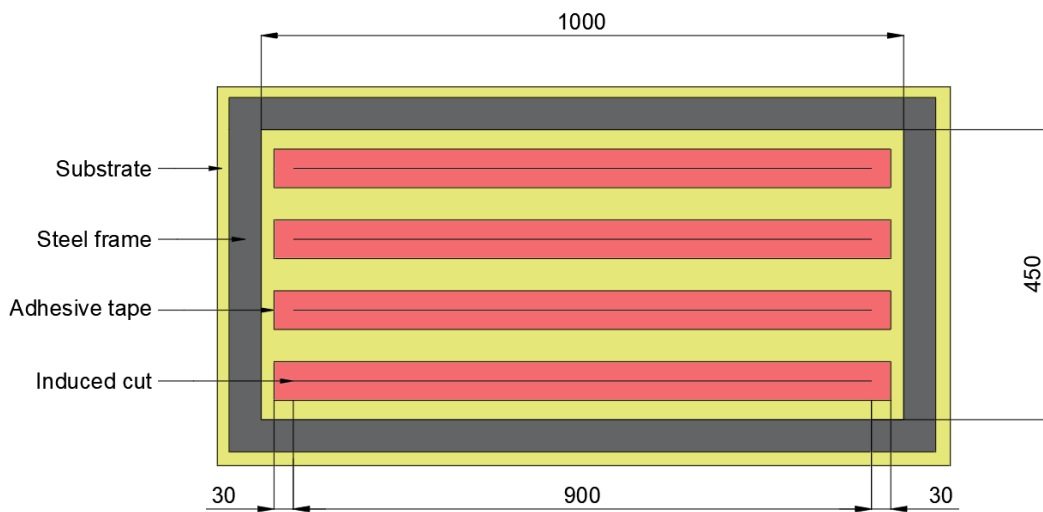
Layout of test specimen with dimensions in *mm*.
